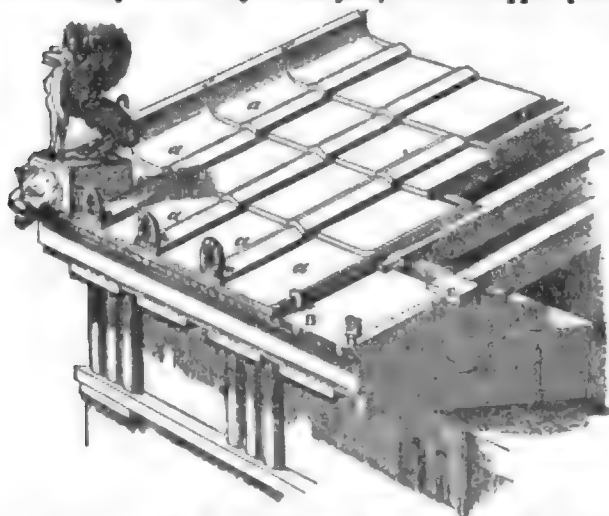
Perspective sketch showing the arrangement of tiles B in fig. 1, at Bassae. B, B, Dowels to fix the joint-tiles. C, tilting piece. a, a, flat surface of tiles.
